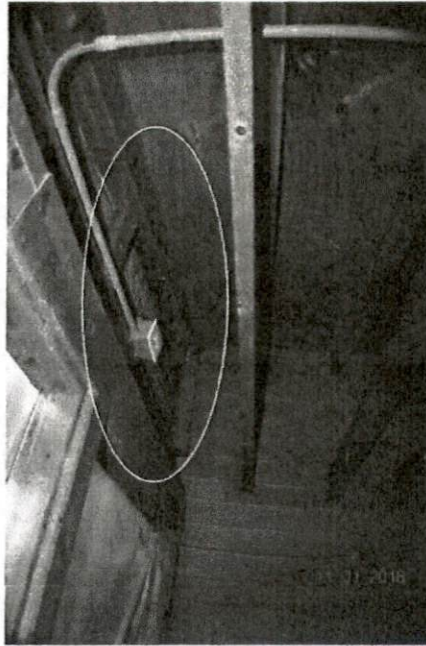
The left corner pier is damaged. Note the sill beam.
